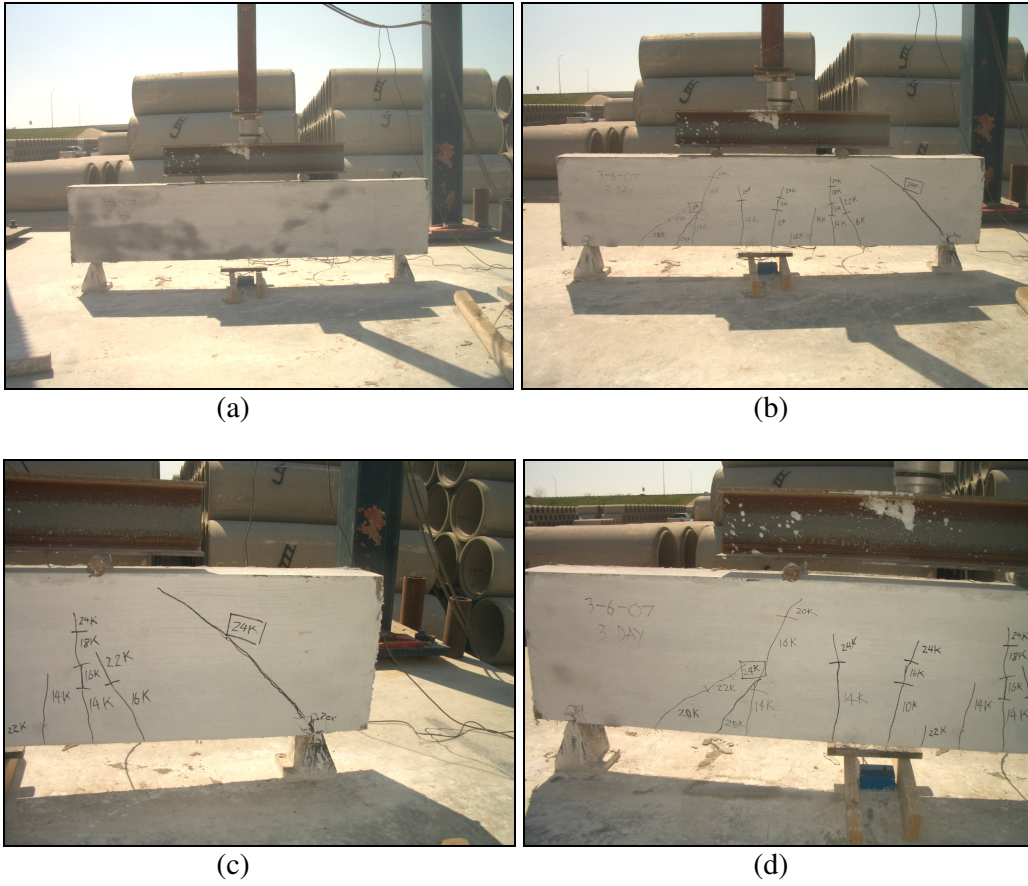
Ductile lightweight concrete beam with reinforcement cast on 3/6/07 for 3 day test; (a) before test, (b), (c), and (d) cracks on the beam after test
